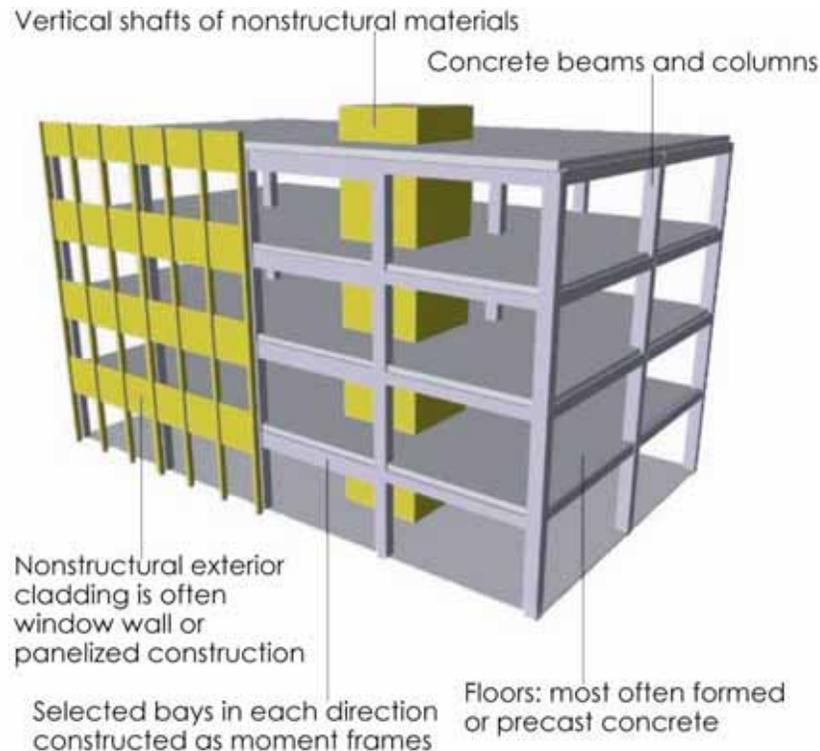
Building Type C1: Concrete Moment Frames
